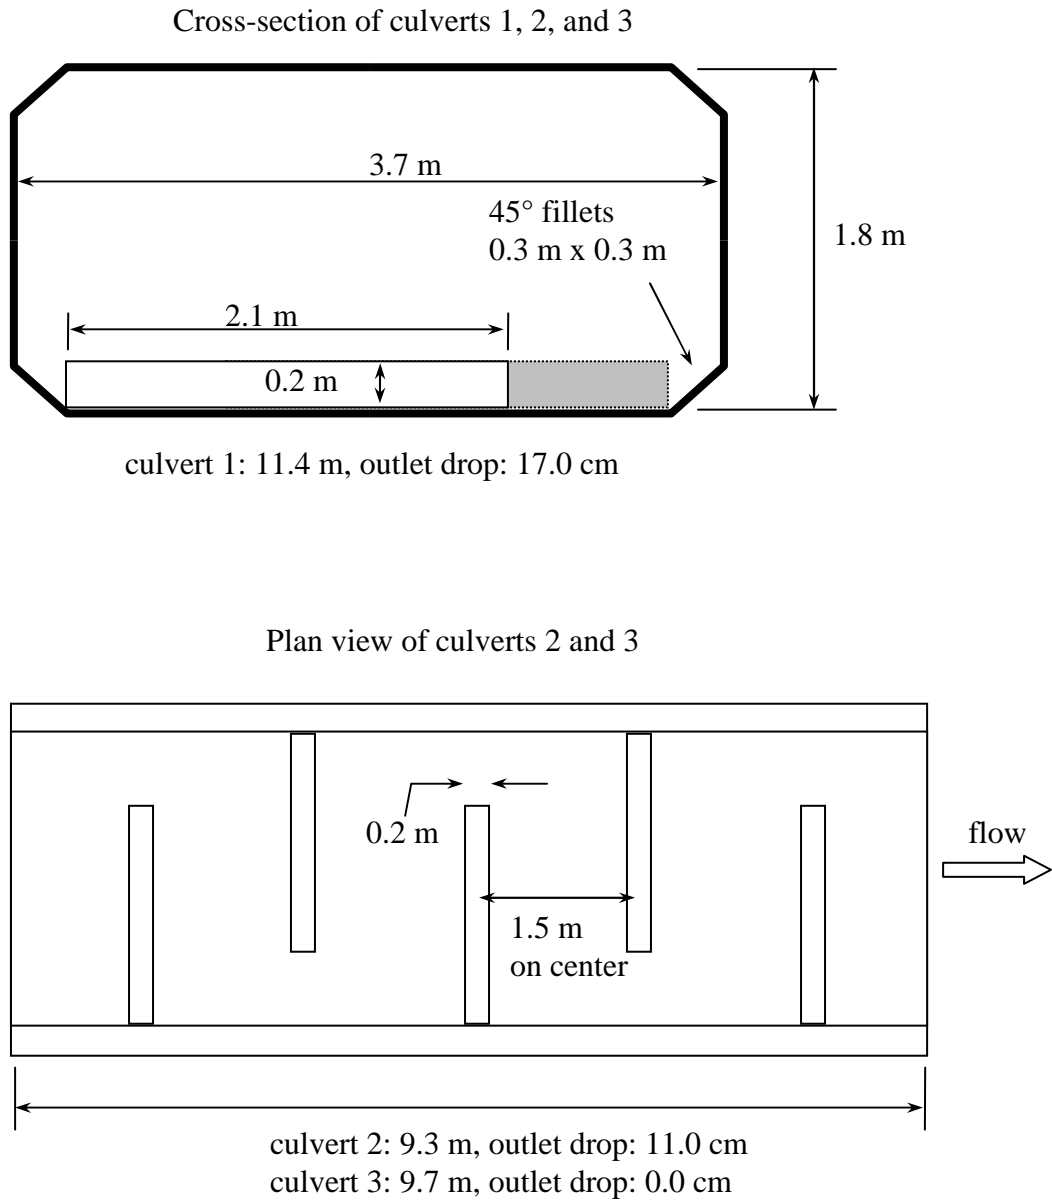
Cross-sectional and plan view of concrete box culverts 1, 2, and 3. The three culverts have the same dimensions however, culvert 1 has no baffles.
